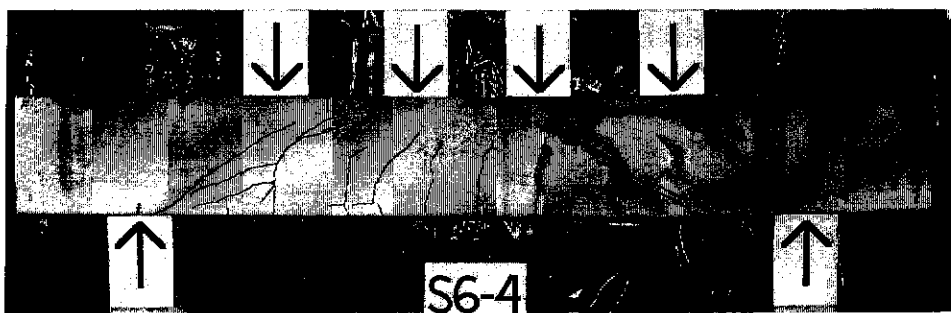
Crack Pattern of the Front Face of Beam S6-4
